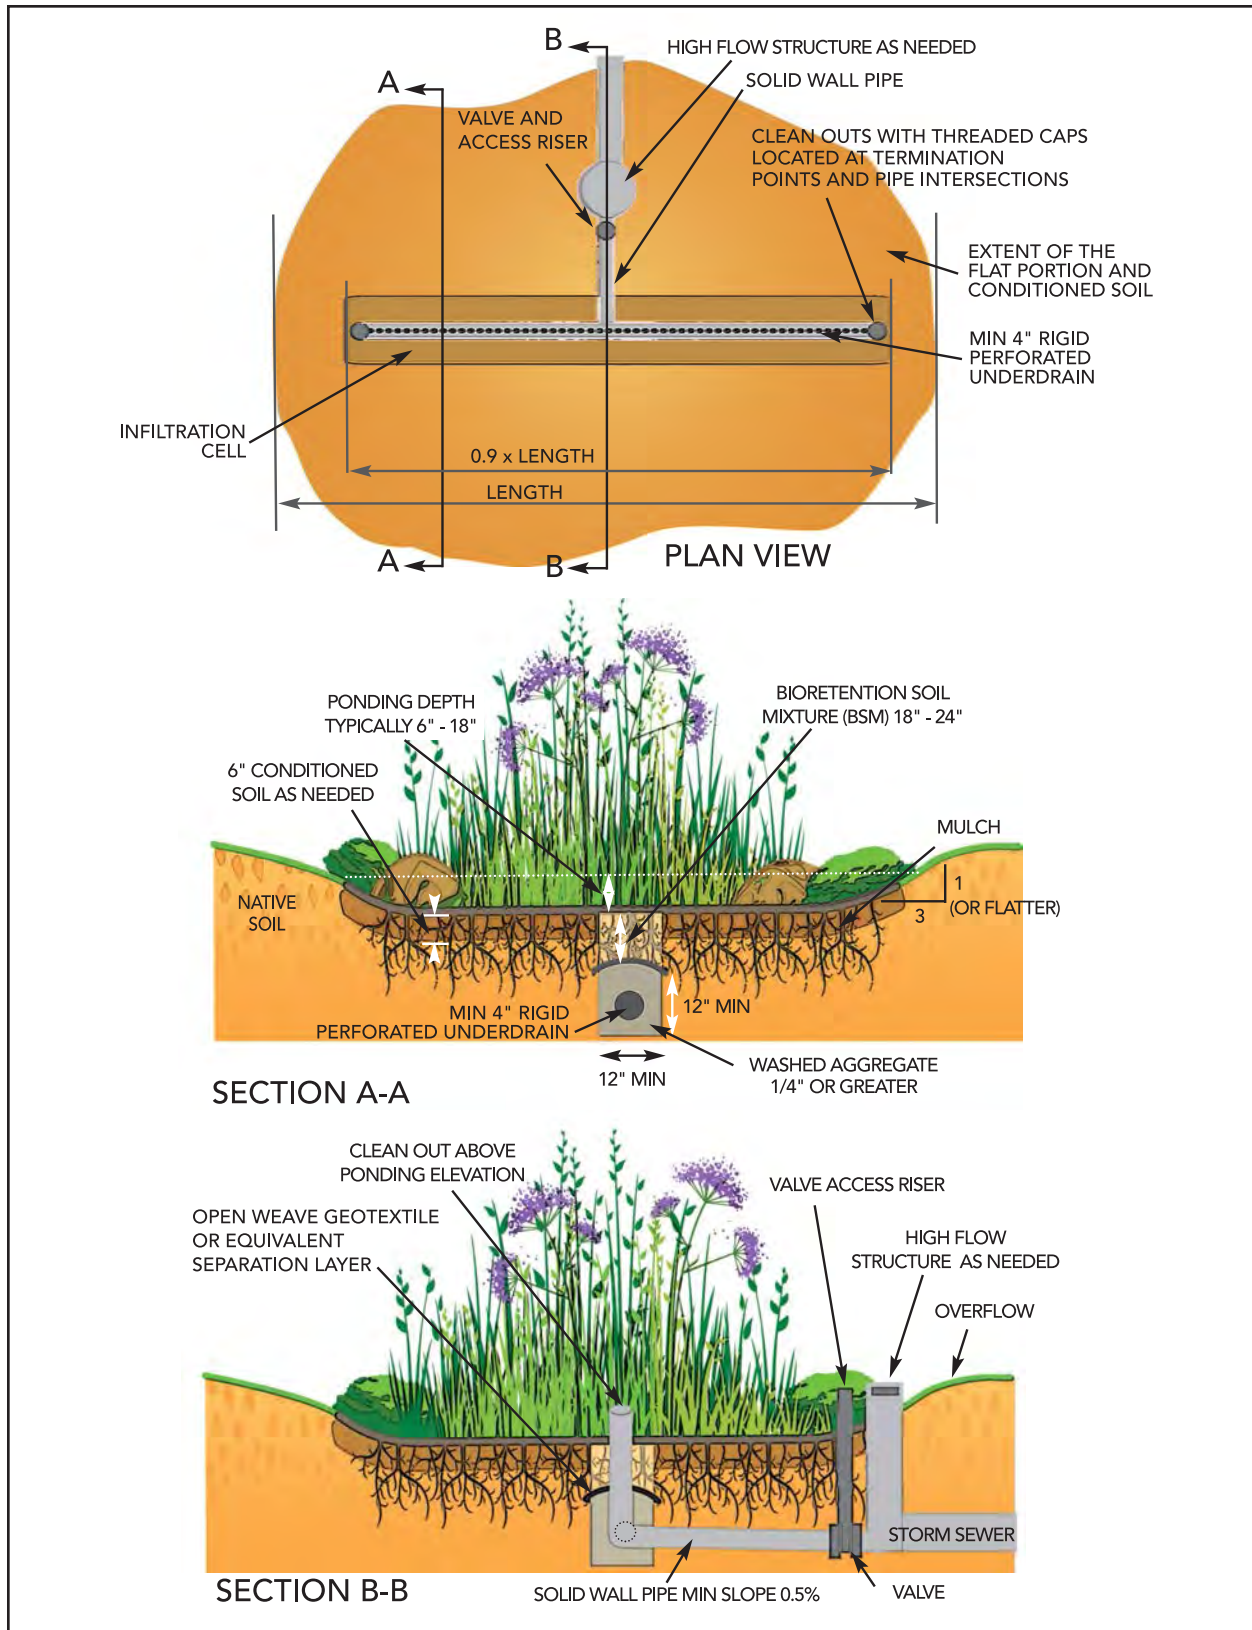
Cross Section Schematic of Bioretention System with Valve Outlet or Orifice Control
